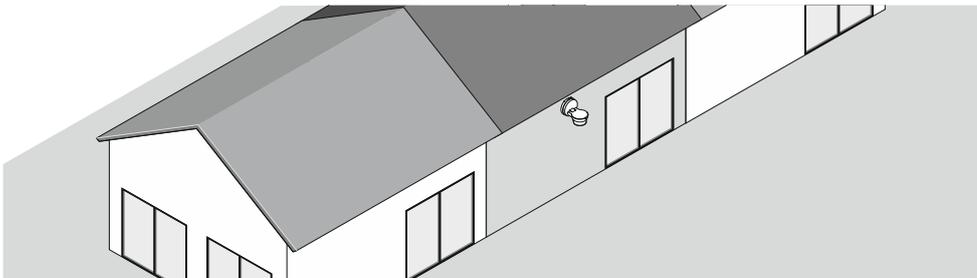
Wall mounting on central terraced house 6851/9-xxx
